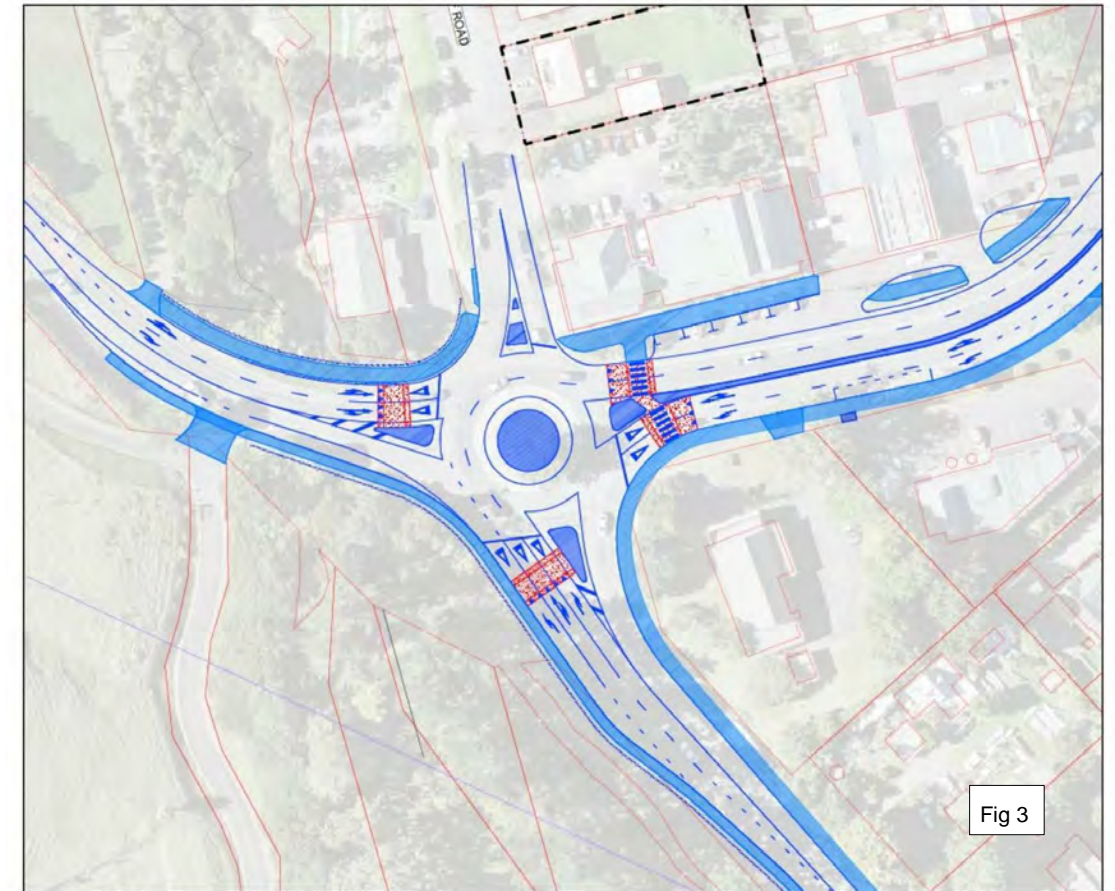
Proposed Upgrade to Whitford Maraetai Road / Whitford Road roundabout
